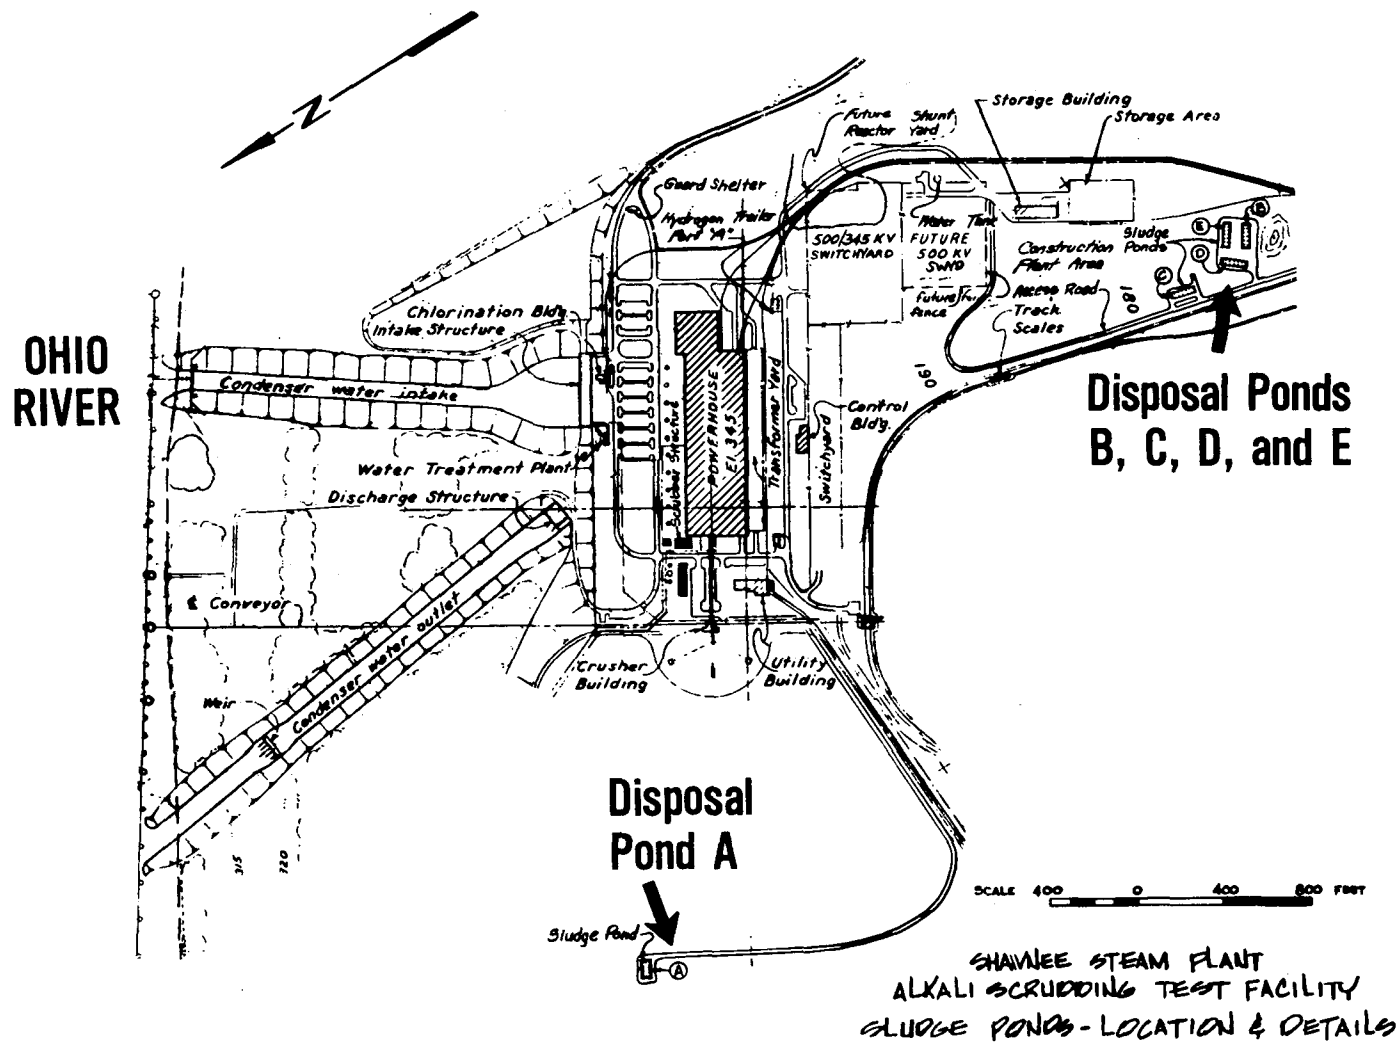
Shawnee steam plant alkali scrubbing test facility, sludge ponds location, and details (courtesy of TVA)
